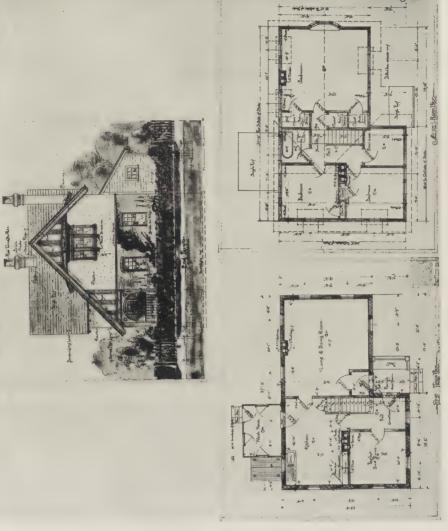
ELEVATION AND PLANS OF SEVEN-ROOM HOUSE—ALUMINUM CO. OF AMERICA, MASSENA, N. Y. ALBERT H. SPAHR, ARCHITECT.
